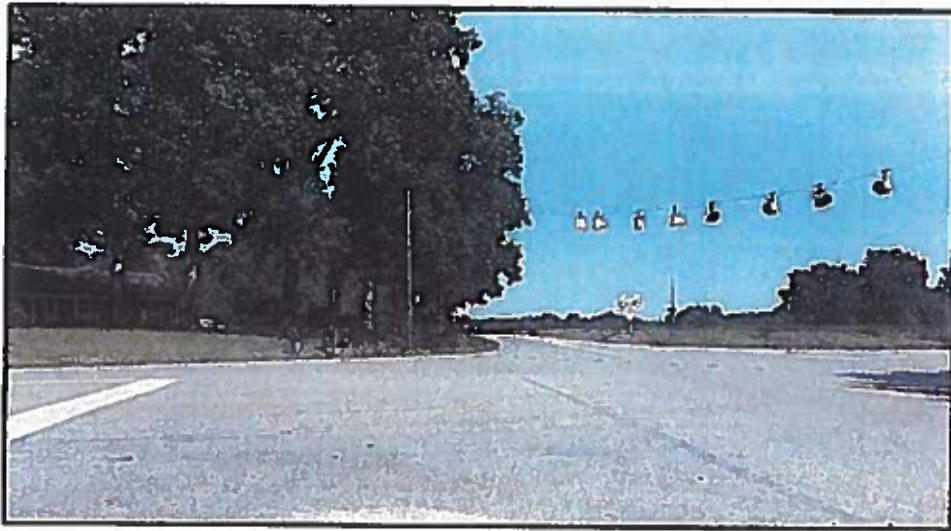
Sight Distance EB on Sussex Dr. (VA Route 40)
